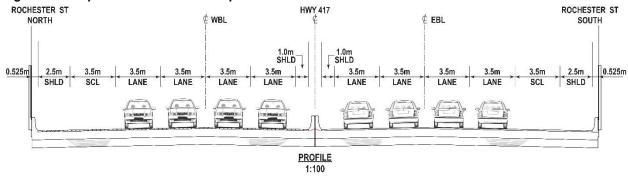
Proposed Rochester Street Overpass Cross-Section
